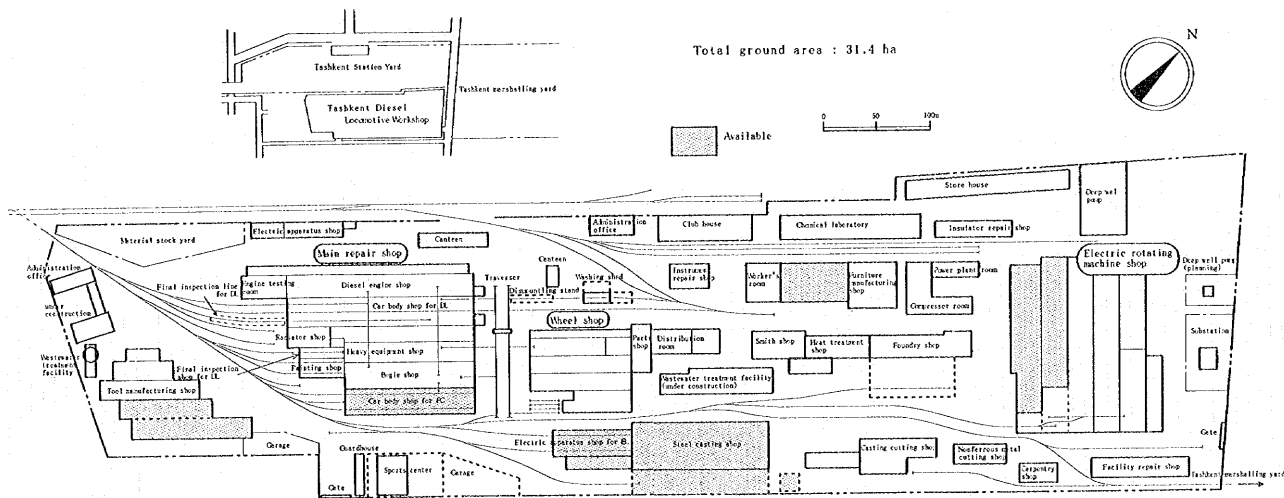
LAYOUT OF TASHKENT WORKSHOP (Available parts for construction of electric locomotive repair workshop)
